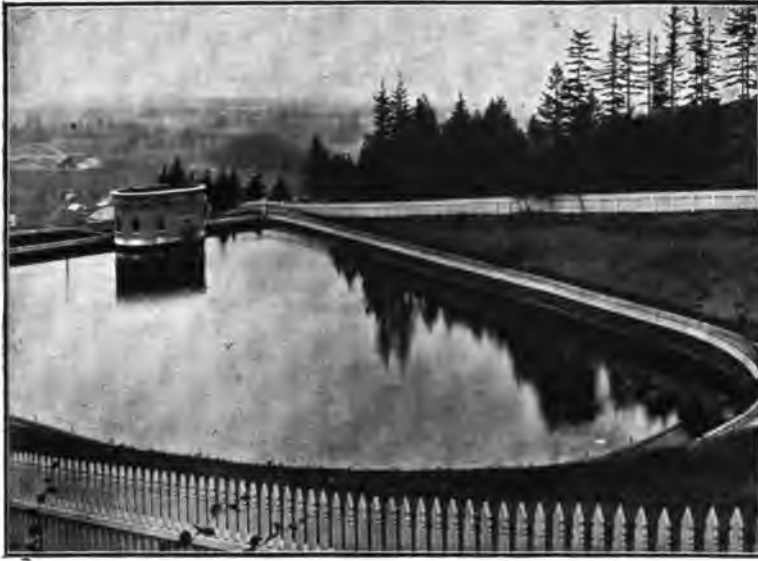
RESERVOIR NO. 1, PORTLAND, ORE., WATERWORKS. CONCRETE DAM WITH EARTH BACKING.
